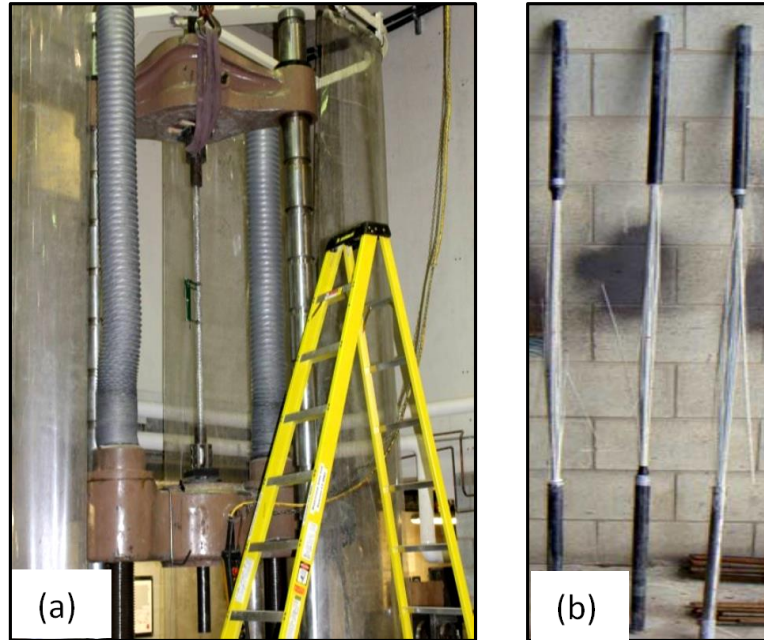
Typical tension testing of GFRP bar: (a) Test setup; (b) GFRP bar rupture.
